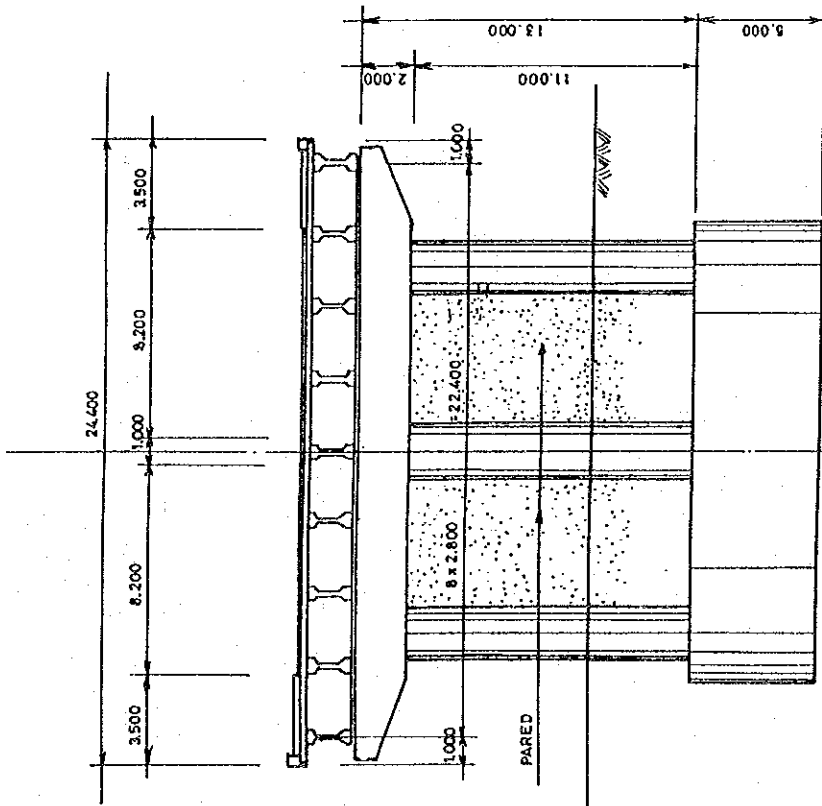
Symple Post-tensioning Girder with Dumbbell Pier on Pile Foundation
